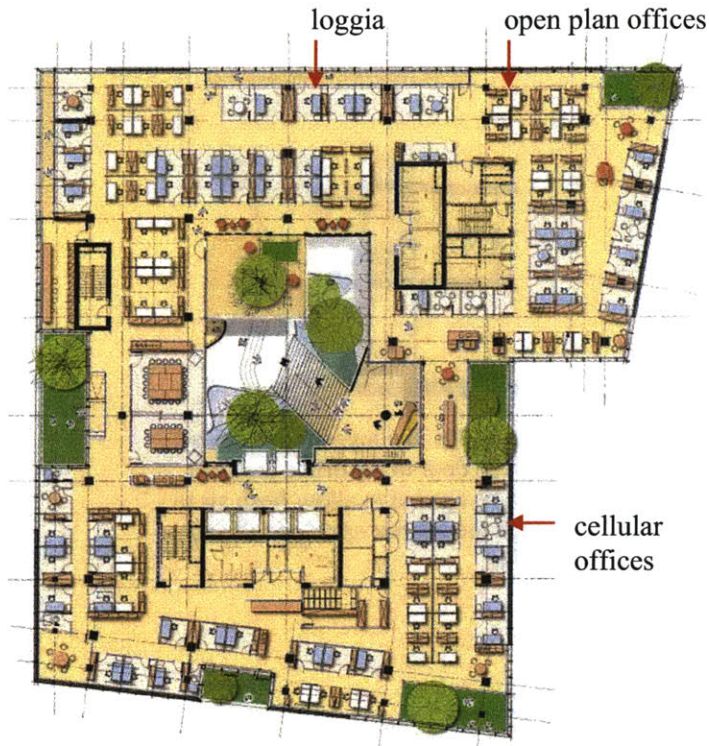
Schematic floor plan shows cellular vs. open plan (*Behnisch*)
